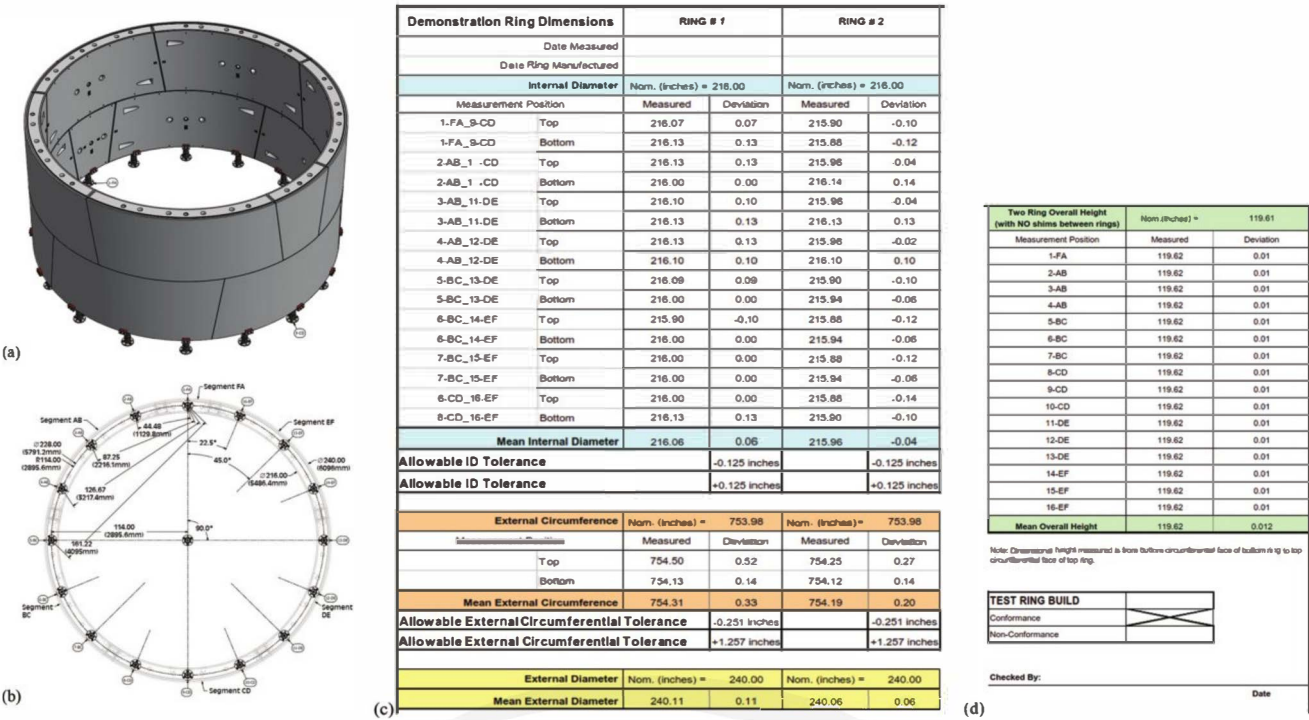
Two-ring test ring in preproduction phase: (a) schematics of test ring setup in isometric view; (b) typical reference locations for dimension control in plan view; (c) typical dimensional control Sheet 1 for a midsize tunnel; and (d) typical dimensional control Sheet 2. (Note: 1 in. = 25.4 mm.)
